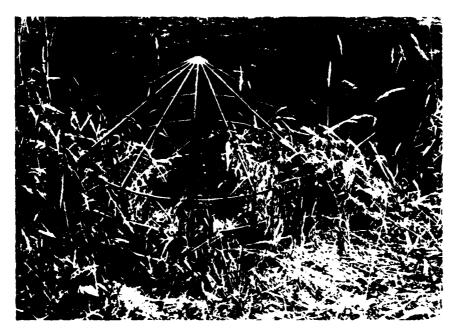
PRINCIPAL SPILLWAY DROP INLET
